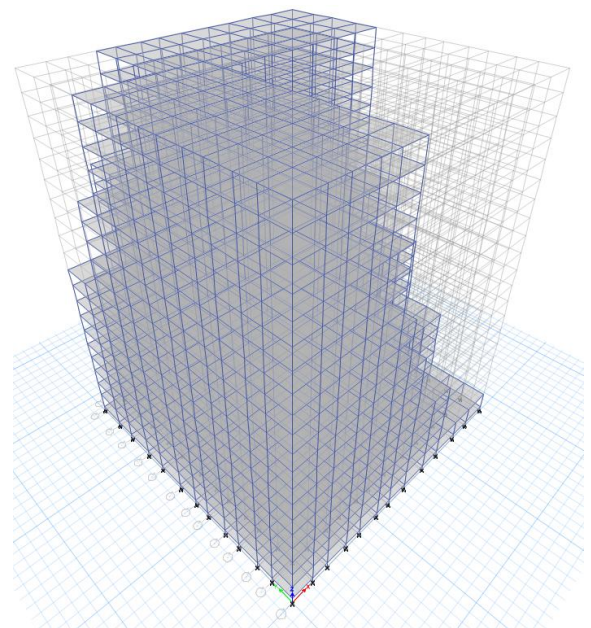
3D VIEW OF HIGH-RISE BUILDING
